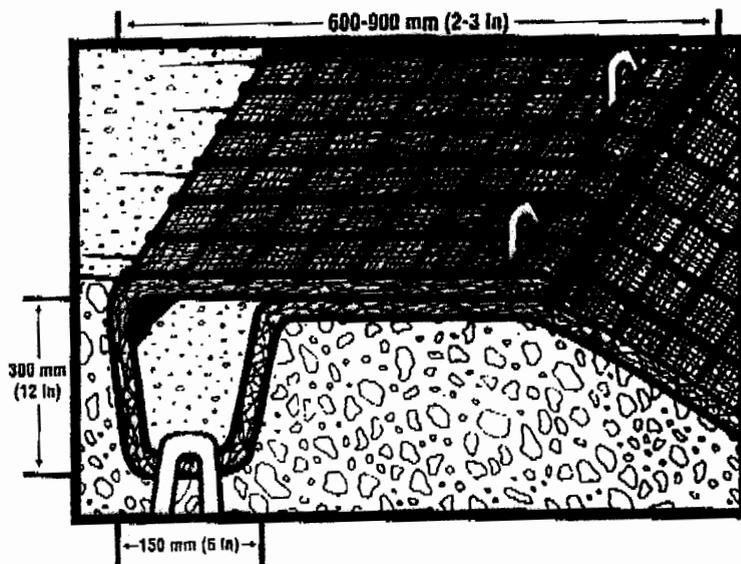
Terminal Anchor Trench (Slopes and Channels)
